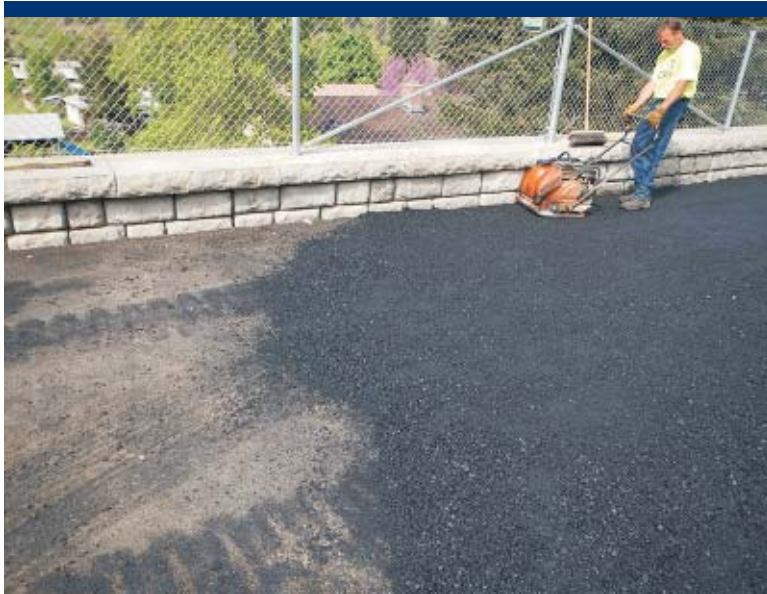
Compacting final asphalt lift along edge of retaining wall.
